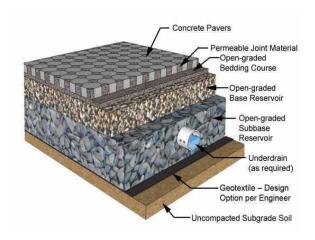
Cross section of typical permeable hardscape. Photo courtesy of Chesapeake Stormwater Network 2014.
